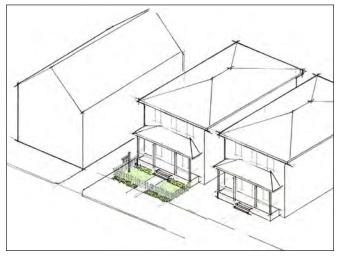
PROPOSED FRONT YARD IMPROVEMENTS.
